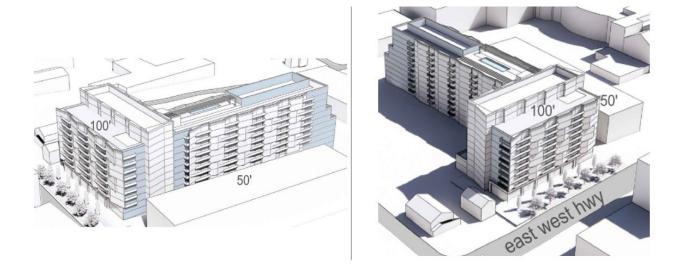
Aerial Perspective Views to the Northwest and Northeast
